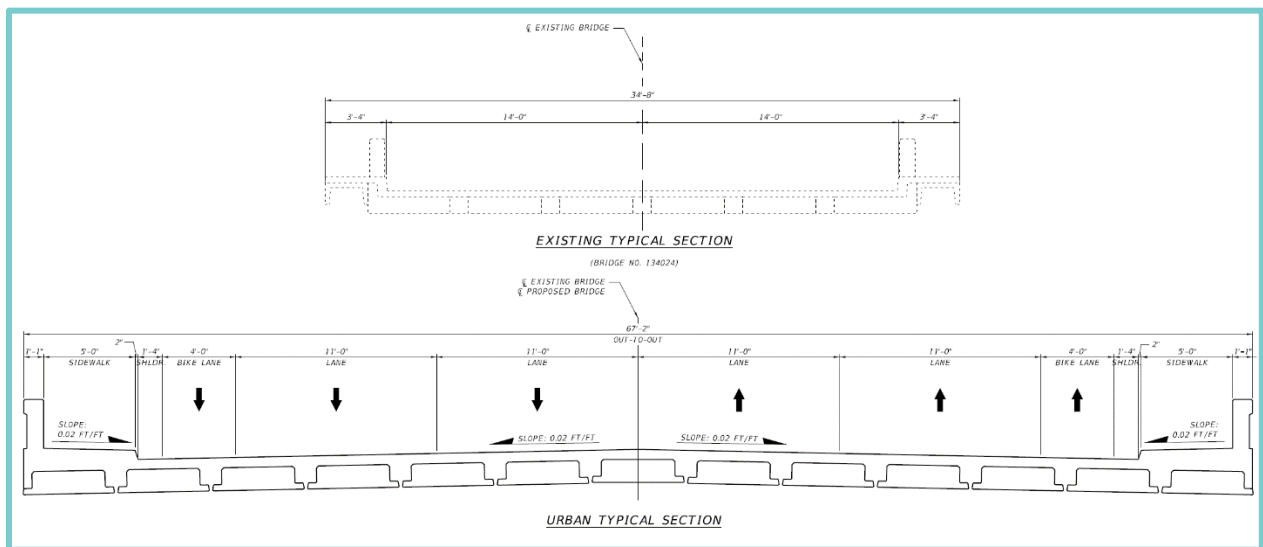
Detoured Construction Alternative (Urban Typical Section)
